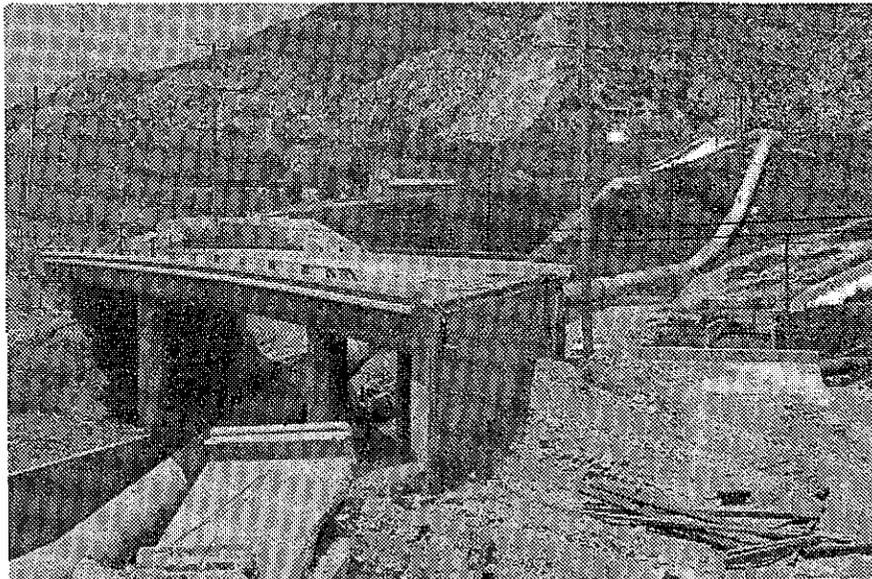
Looking northeasterly at Bridge 53c-316 which carries Foothill Boulevard over the penstock. Immediately to the right of the bridge, the uncovered deck of the aqueduct structure, Bridge 53-1011, is visible.
